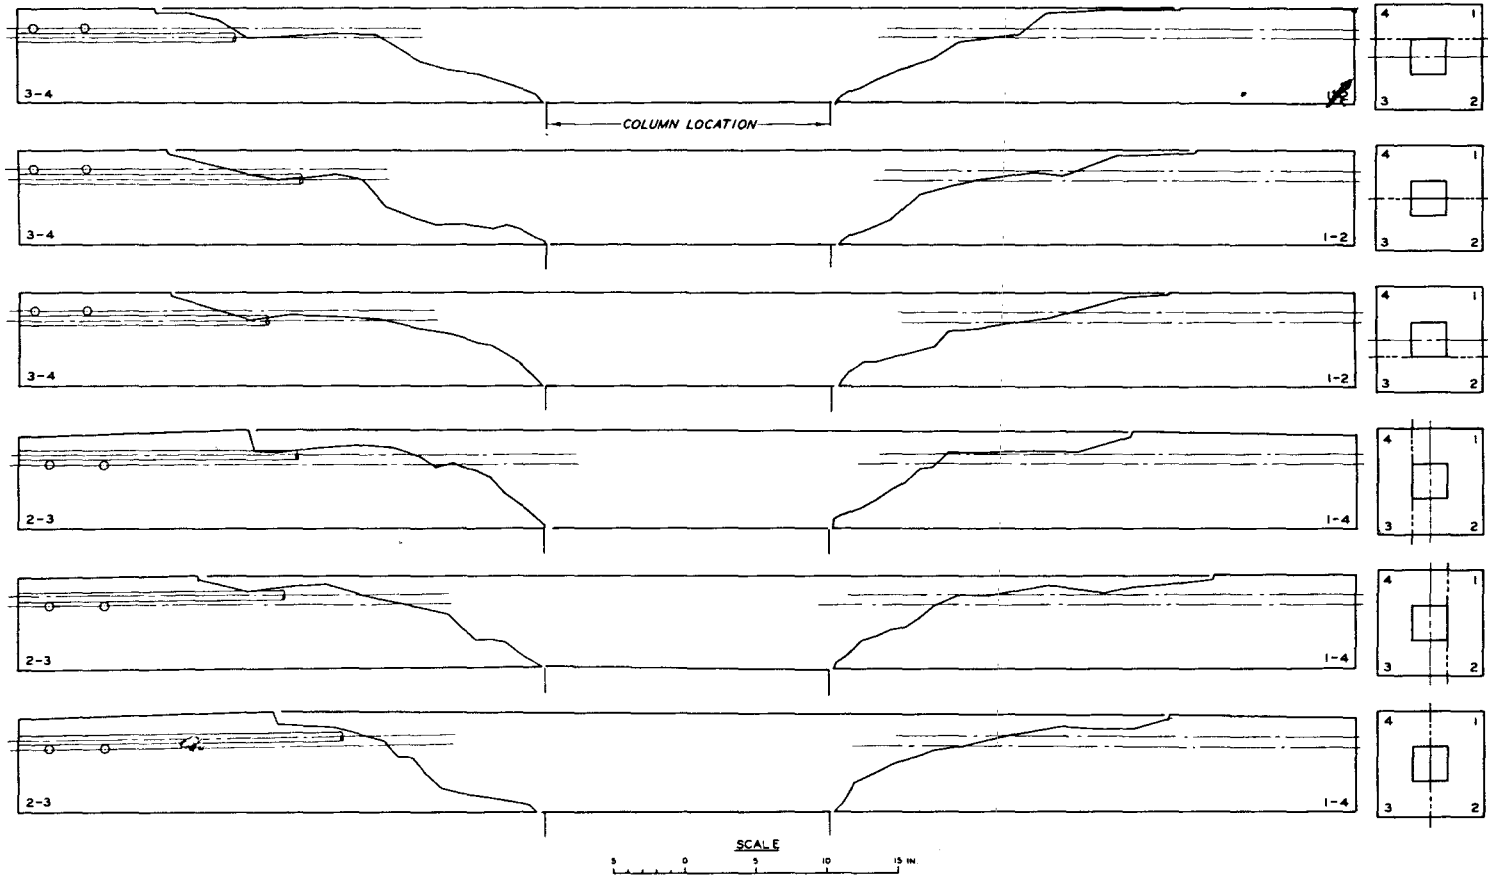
Profiles of slab failure surface, Specimen S4150-2.
